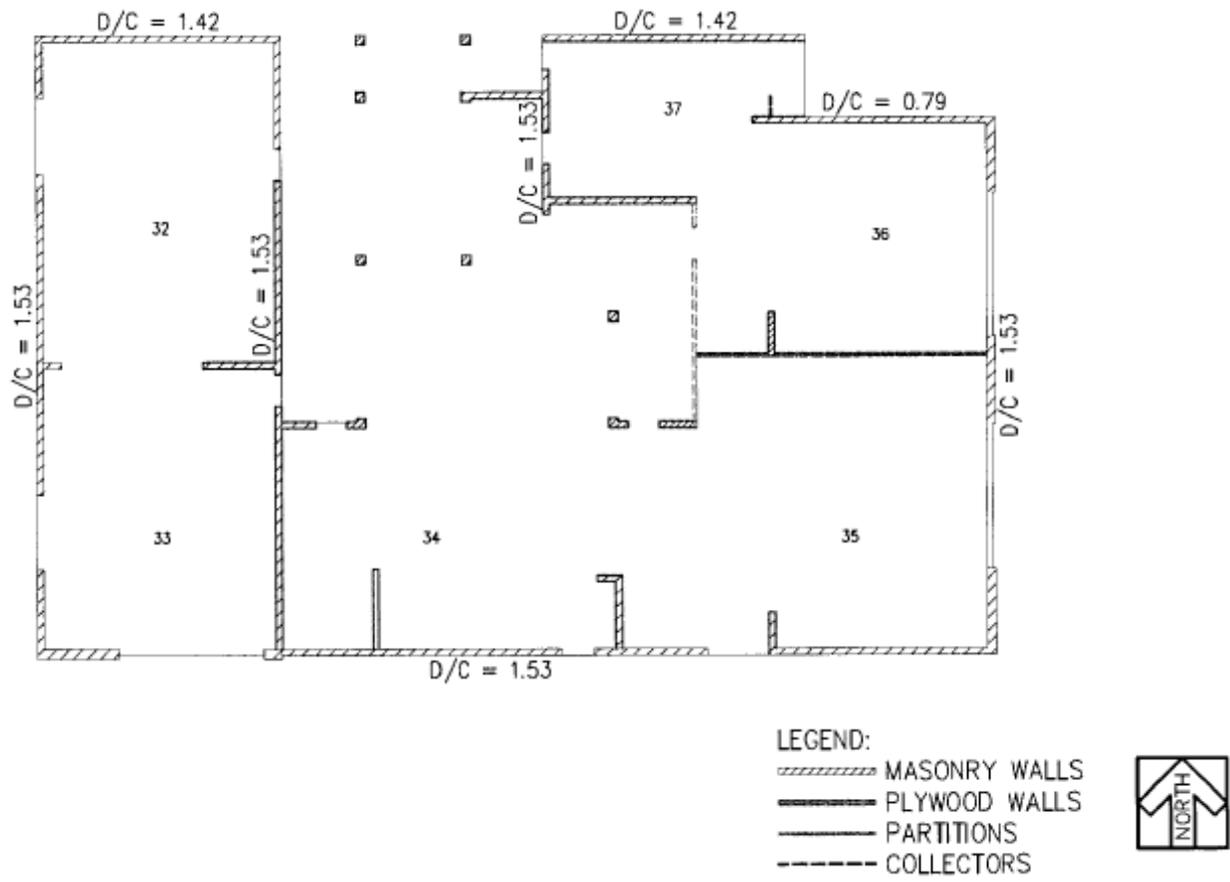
Building C demand-to-capacity ratios (D/C) for anchorage of the walls to the roof for out-of-plane seismic forces.
